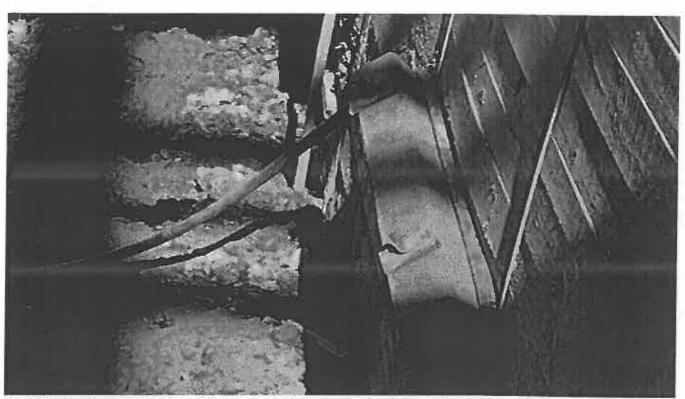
Ongoing pumping of muddy groundwater from foundation footing into active stormdrain onsite.
